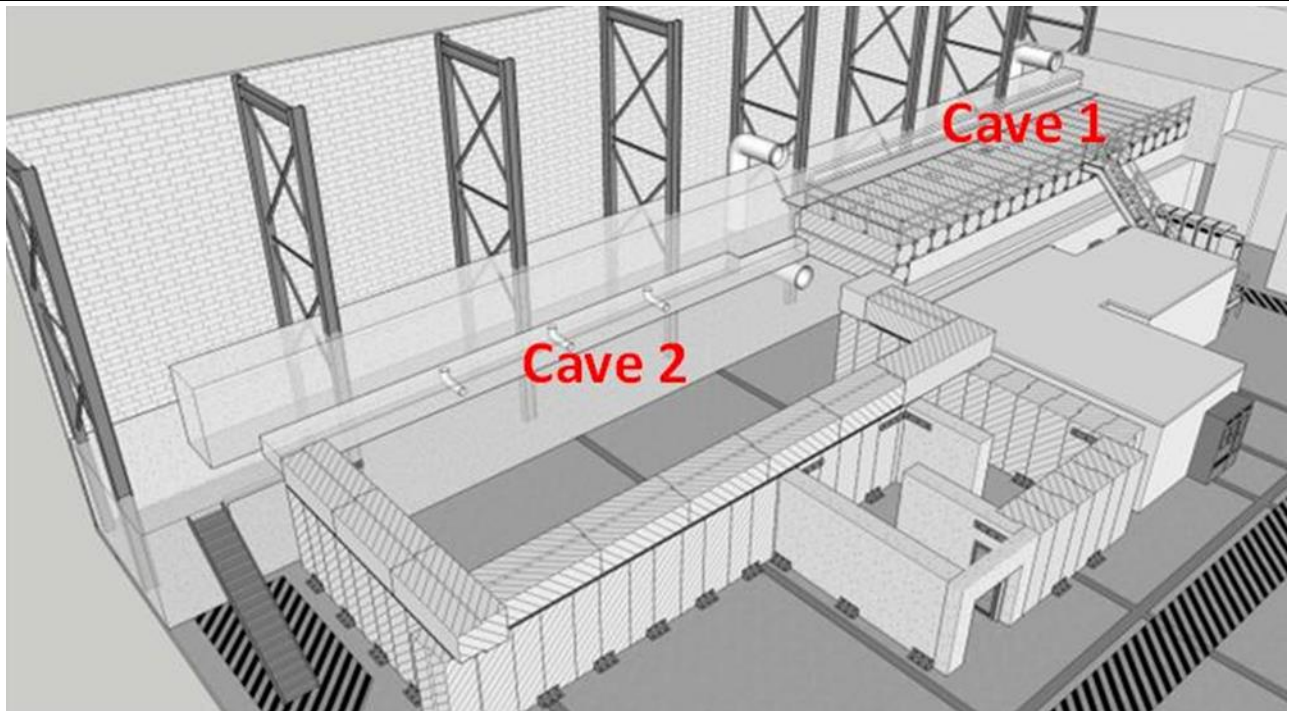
UITF layout showing the main entrance Labyrinth and shielded roof of Cave 1
